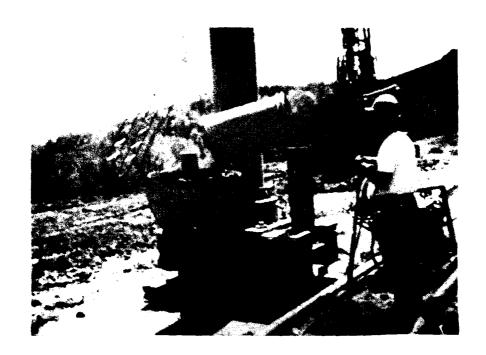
Placing concrete in Panel 23 (April 25, 1984)
